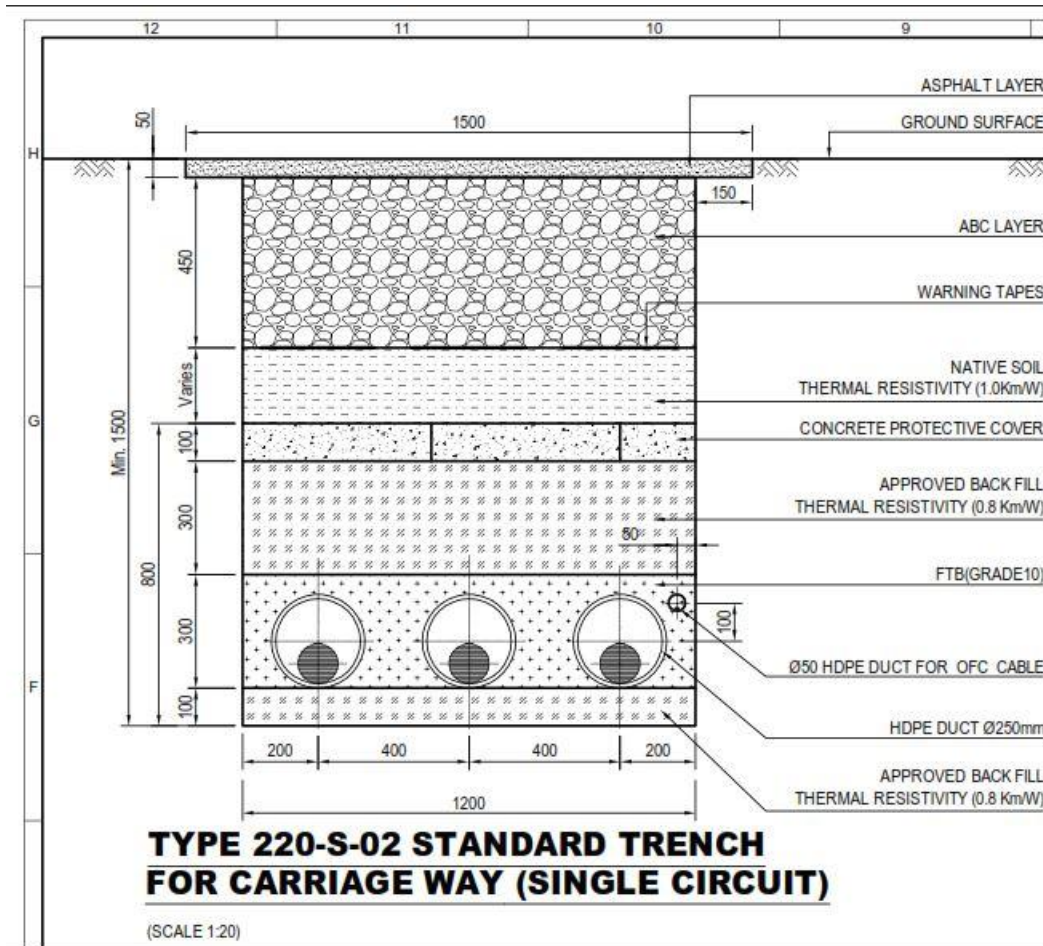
CROSS SECTION OF THE TRENCH WITH CABLES
